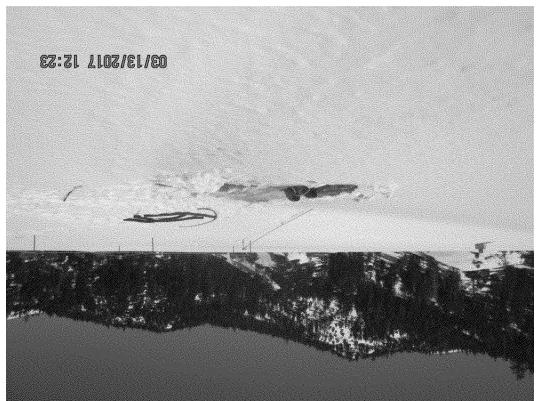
Siphon from Pond 2 South overflow to Pond 3 and RCTS
